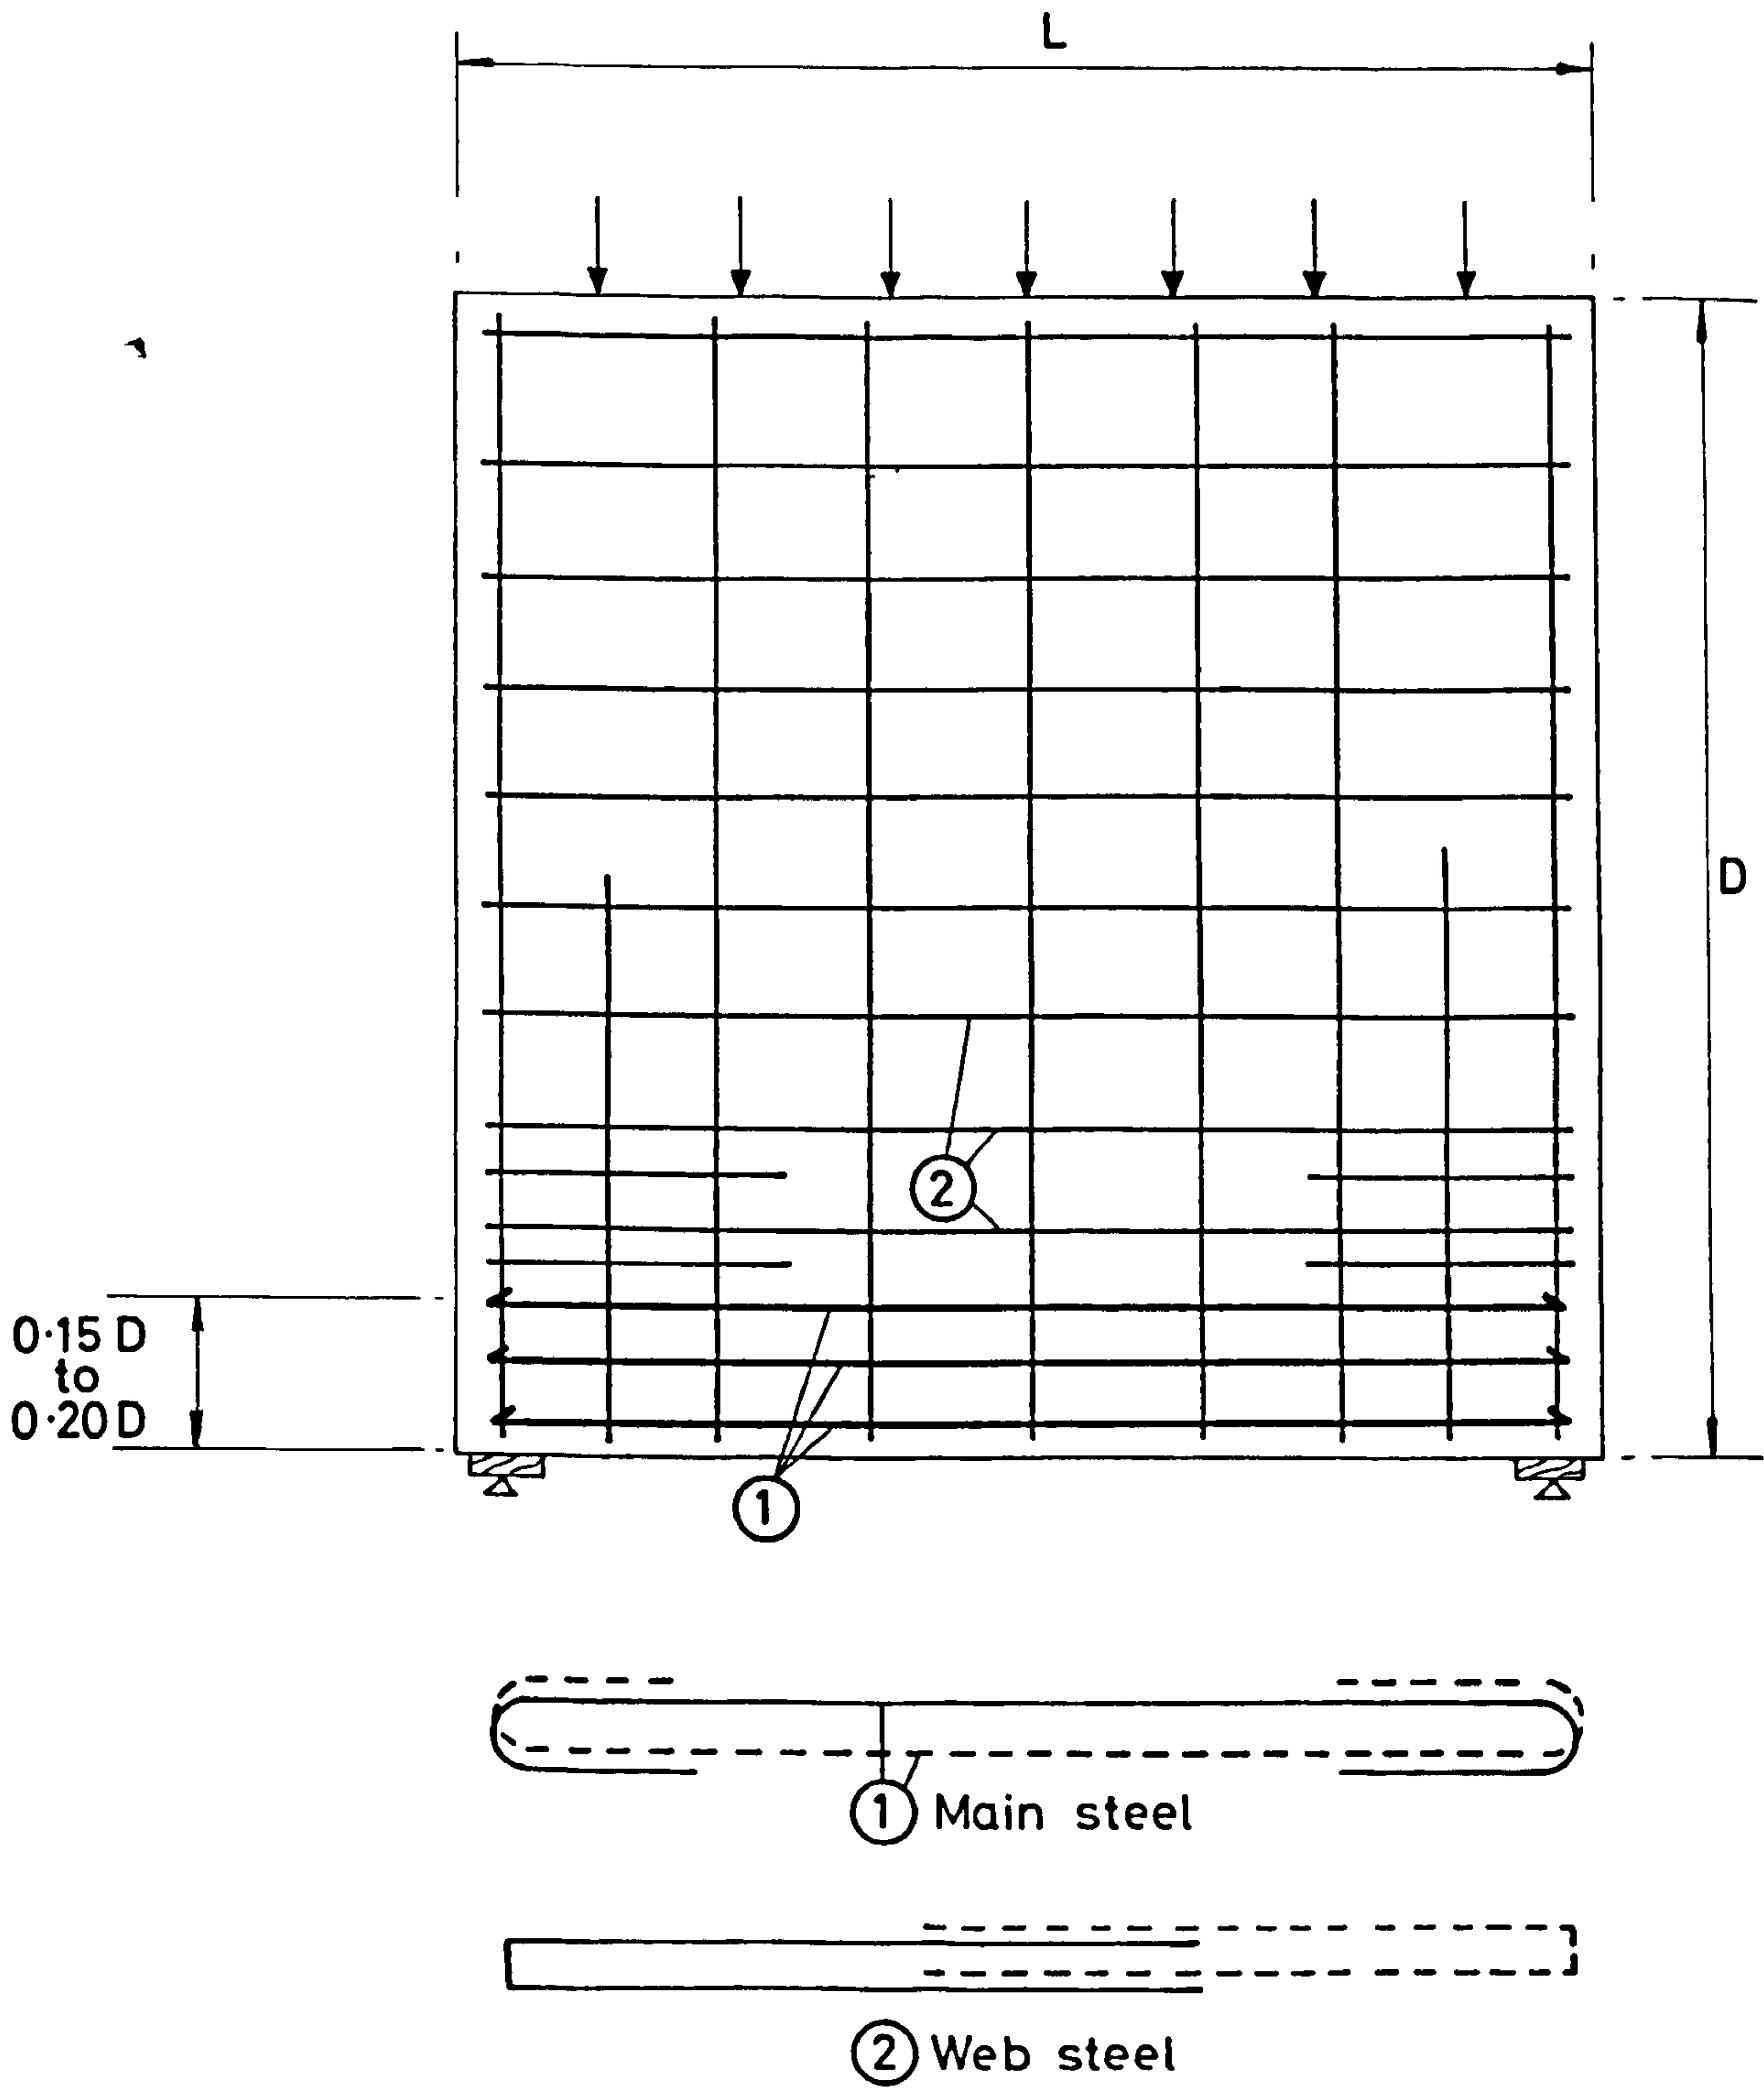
LEONHARDT AND WALTHER: REINFORCEMENT ARRANGEMENT
